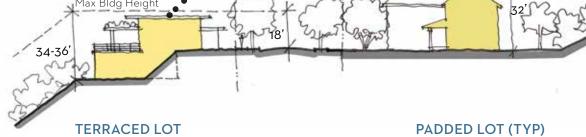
Admiral's Ridge Section and Building Heights by Lot Type
